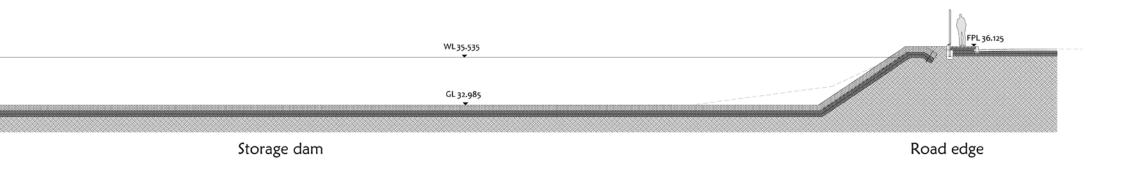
Section G-G: Waste drop-off and storage dam (Author, 2013)
